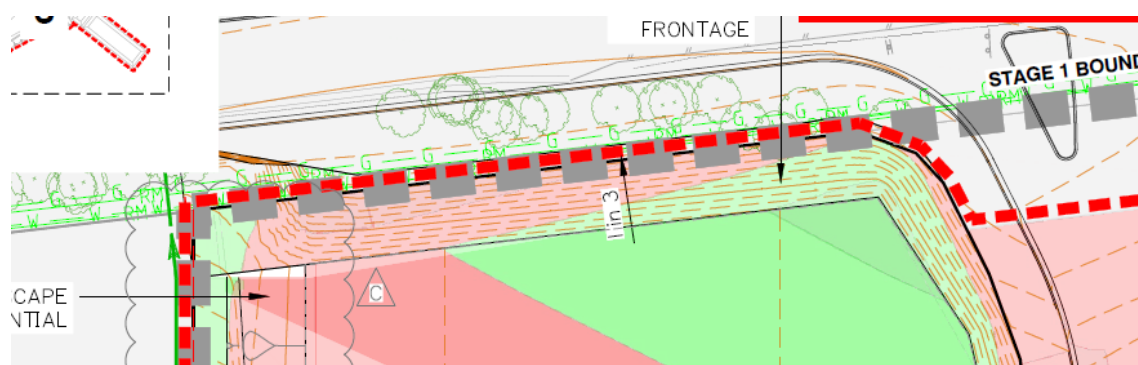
Earthworks details of Stapylton Jacobs Well Road interface
